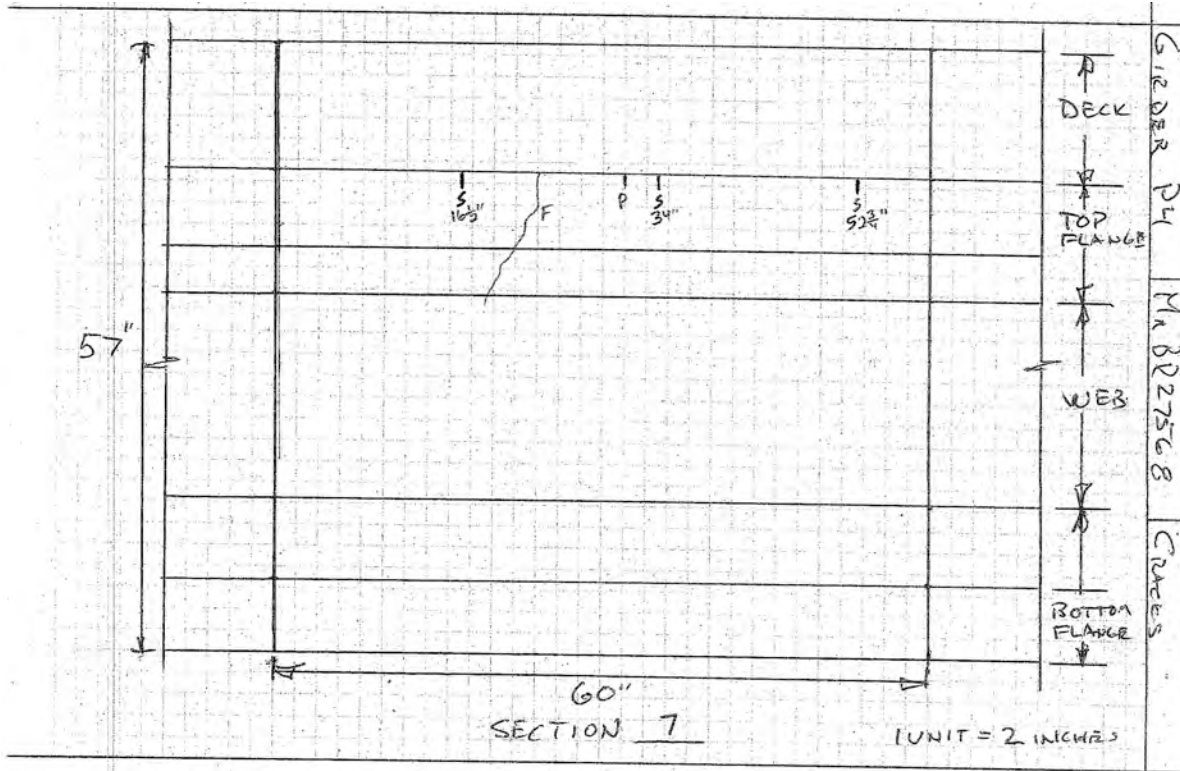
Girder P4 crack pattern – Section 7
